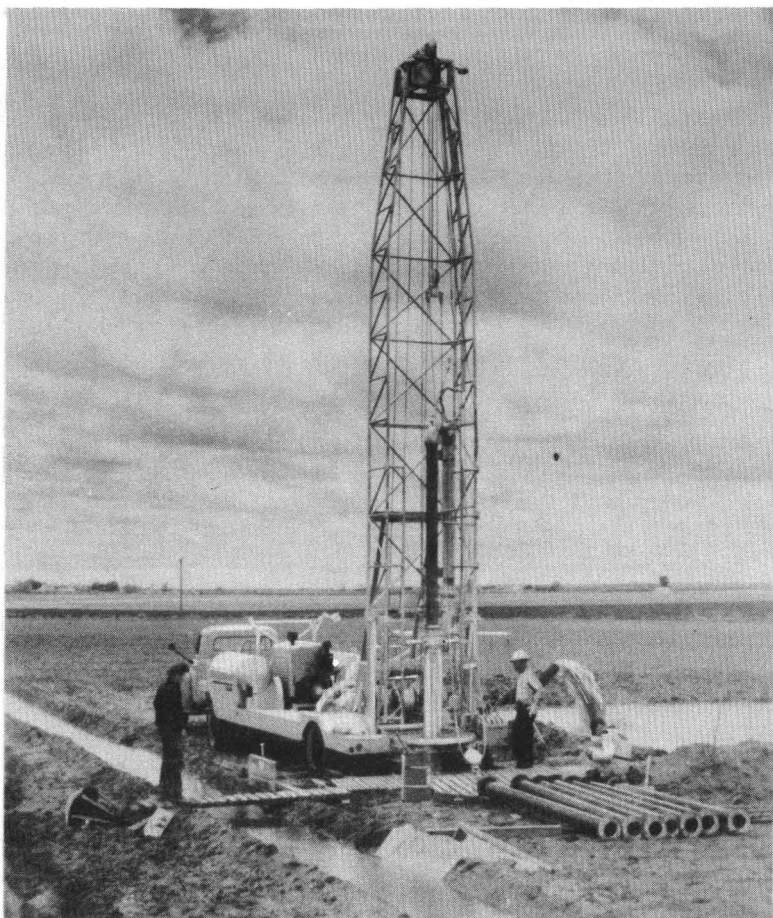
Truck-mounted self-propelled hydraulic drilling rig. (Photograph courtesy of the Winter-Weiss Co.)
